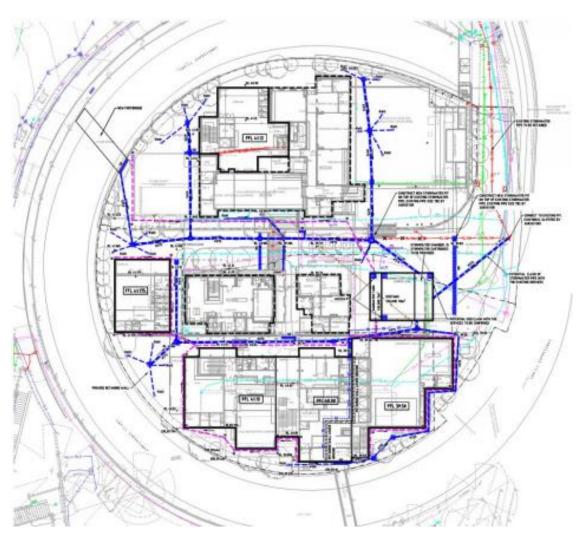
Preliminary Stormwater Layout (Based on the architectural plans dated 06.12.19)
